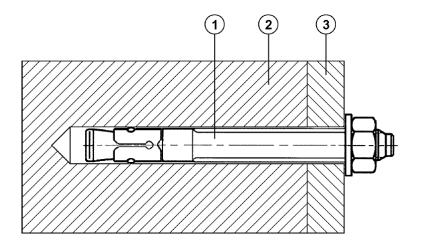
Fastening made with use of a TT-THROUGHBOLT steel expansion fastener of TT, TT-G and TT-SS versions
